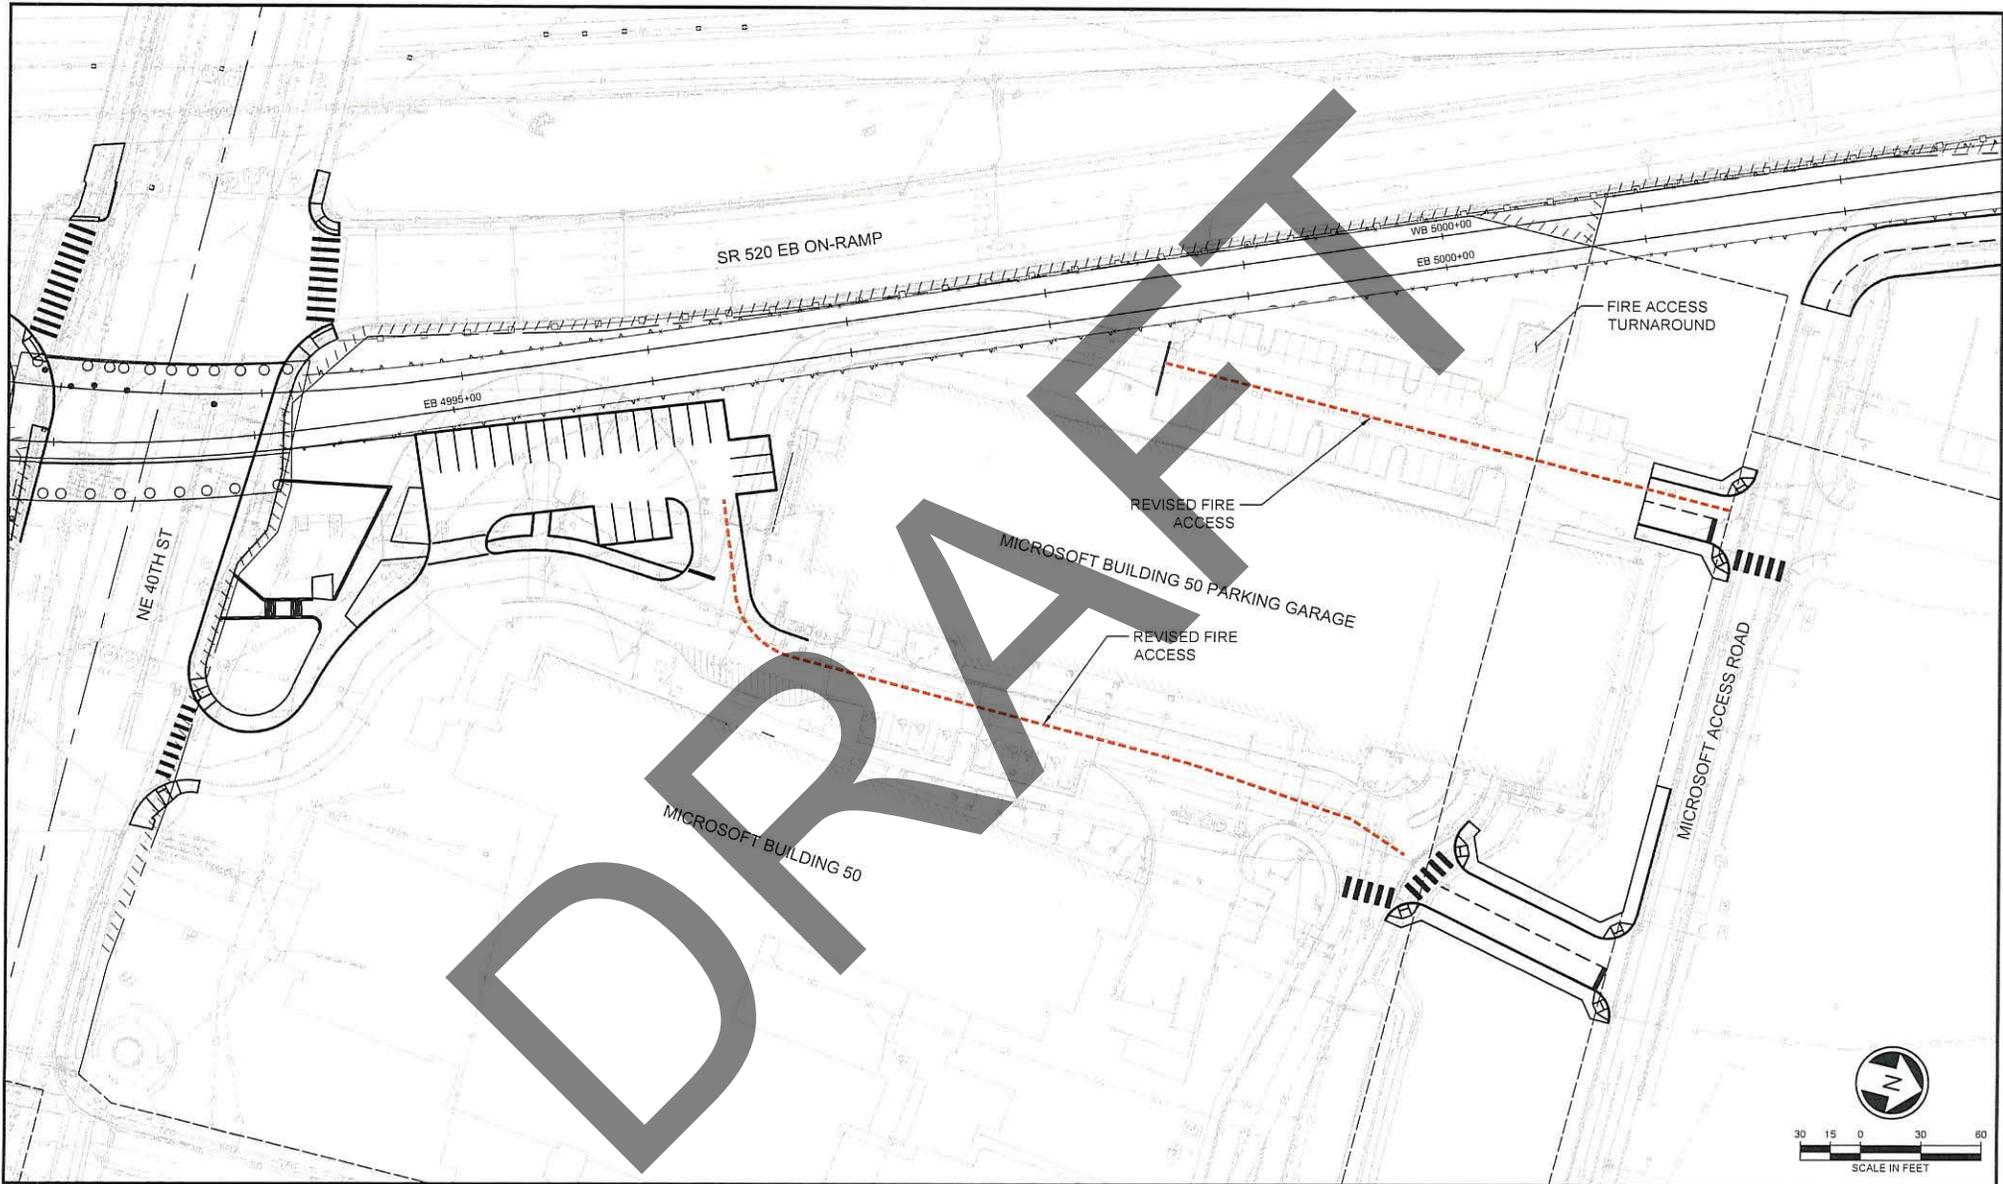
Microsoft Building 50 Parking Garage Existing Fire Access
